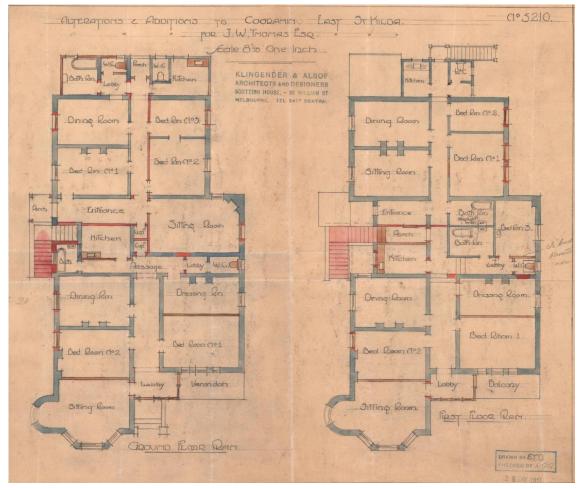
1917 drawing of conversion of the original house at 8 Westbury Street to 4 flats (Source: Building File)
